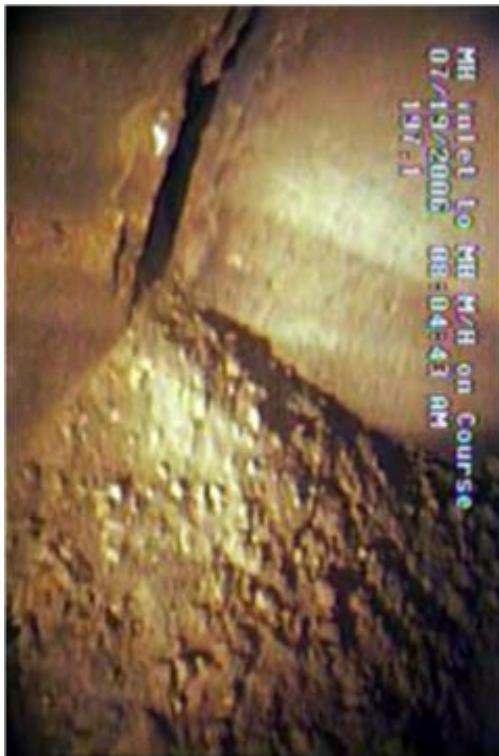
Separated joint (flaw) of reinforced concrete pipe.
